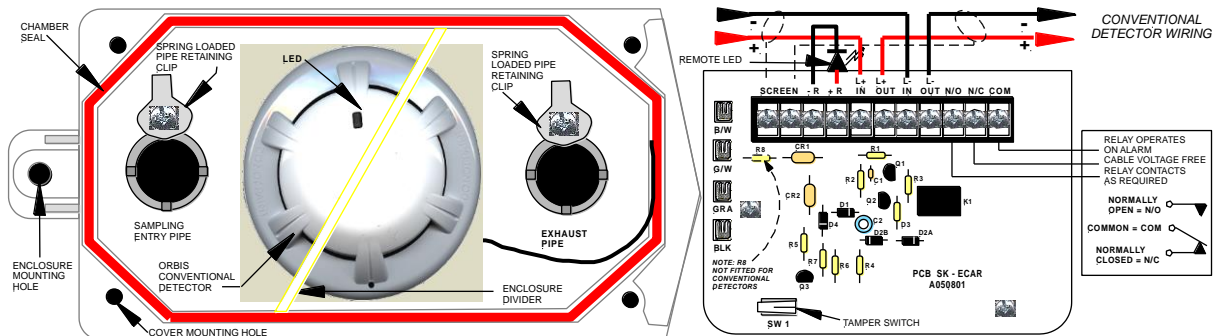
Cutaway View of the Enclosure, Terminal Block & Detector Wiring
